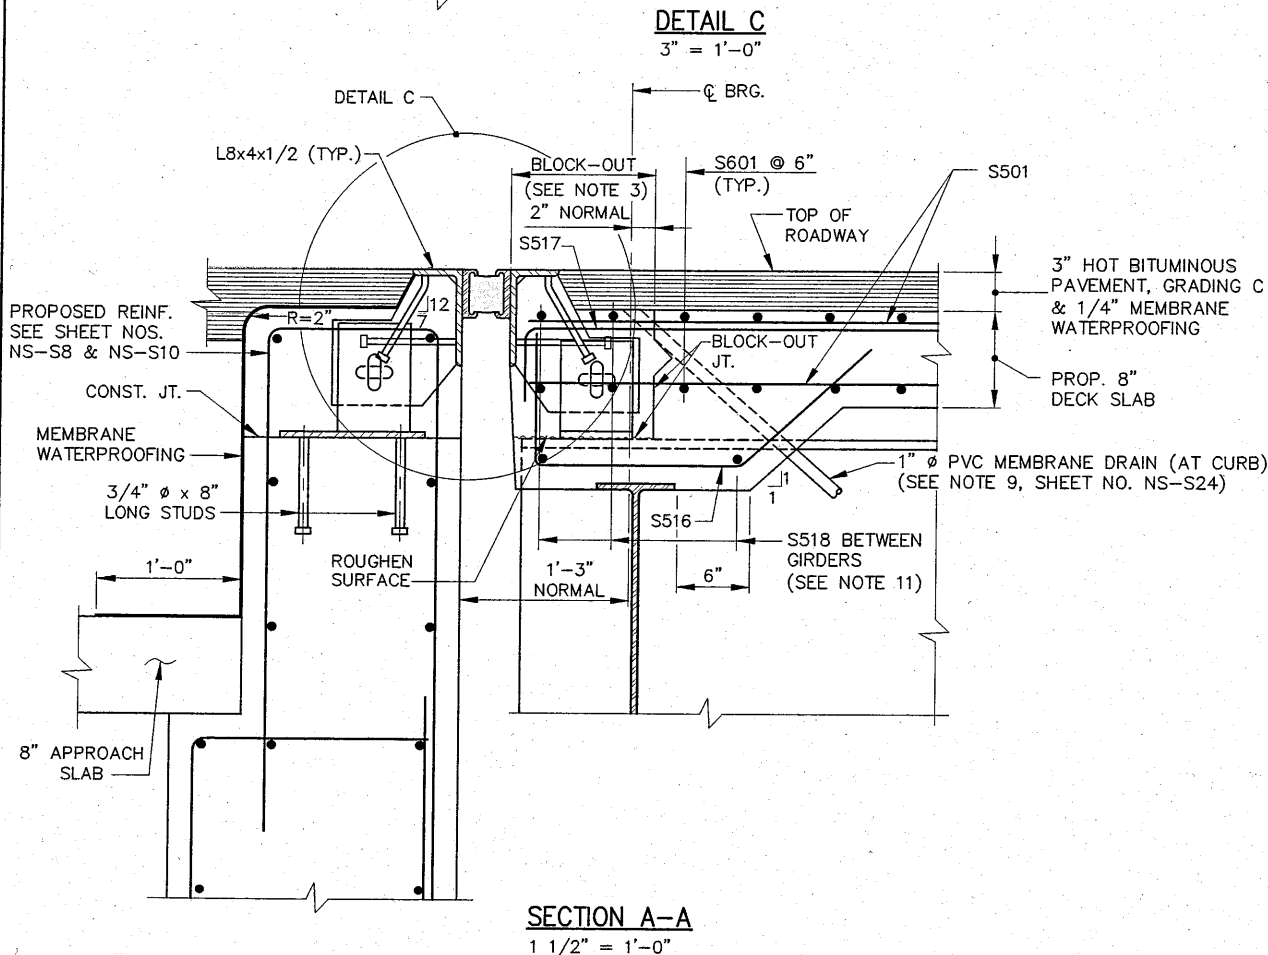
DETAIL -- NEOPRENE COMPRESSION SEAL WITH STEEL EDGE BEAMS
